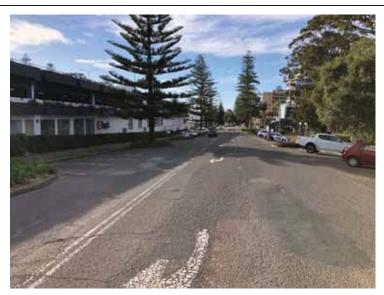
Murray Street, looking north, showing existing carriageway configuration
